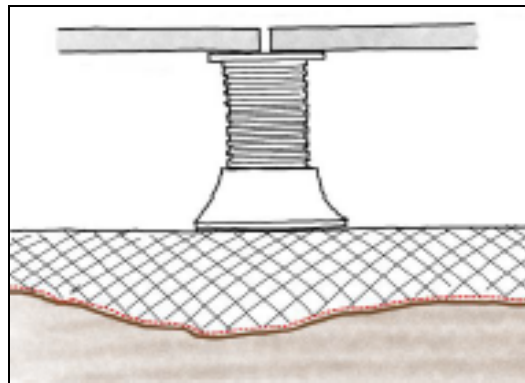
Pedestal on Hardcore on Geotextile on existing ground.
